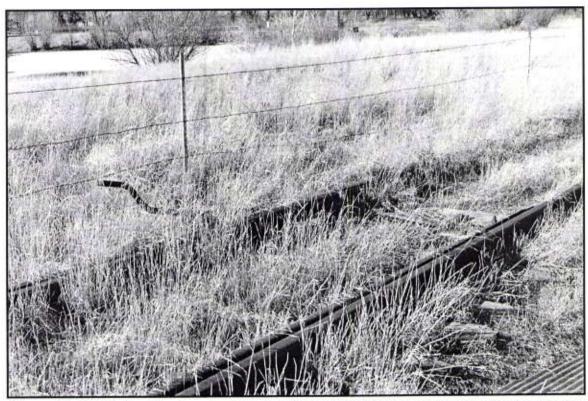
Switch handle where short track of Western Clay Spur began heading toward Kessler Brewery (north of current project area), facing north-northwest.
